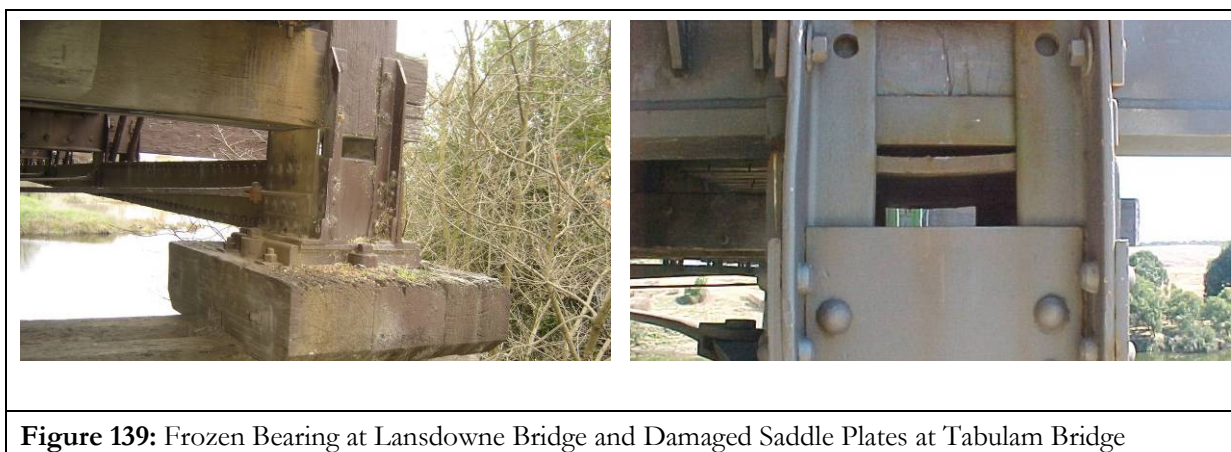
Frozen Bearing at Lansdowne Bridge and Damaged Saddle Plates at Tabulam Bridge
